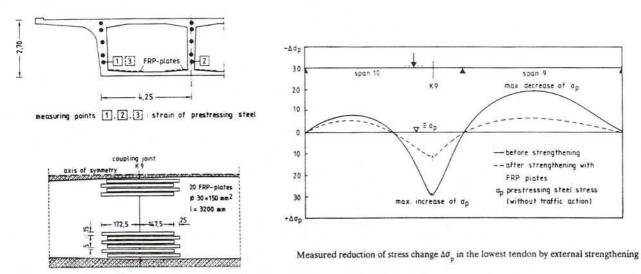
Strengthening Kattenbusch Bridge with CFRP plates (165).
